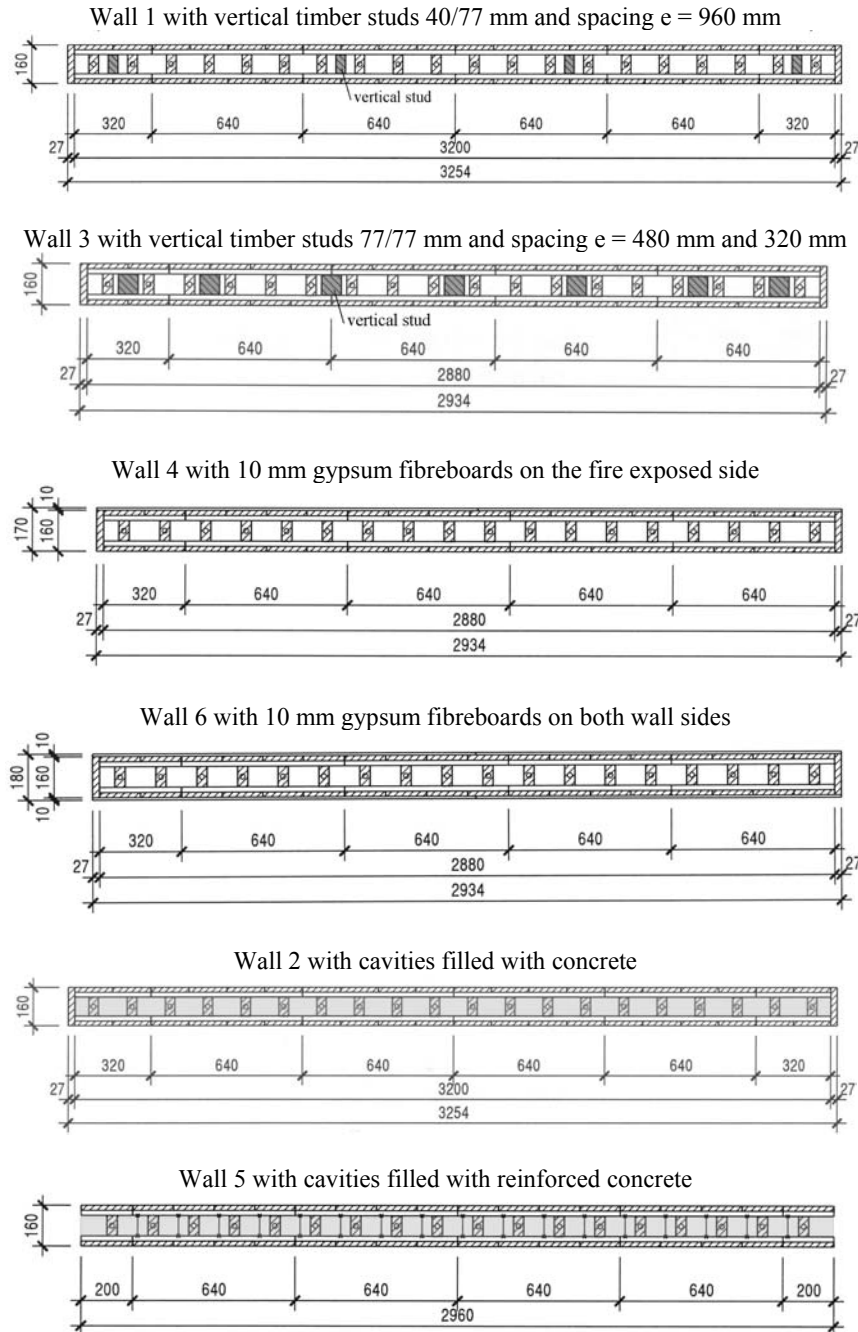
Cross-sections of the timber block walls tested under ISO-fire exposure.
